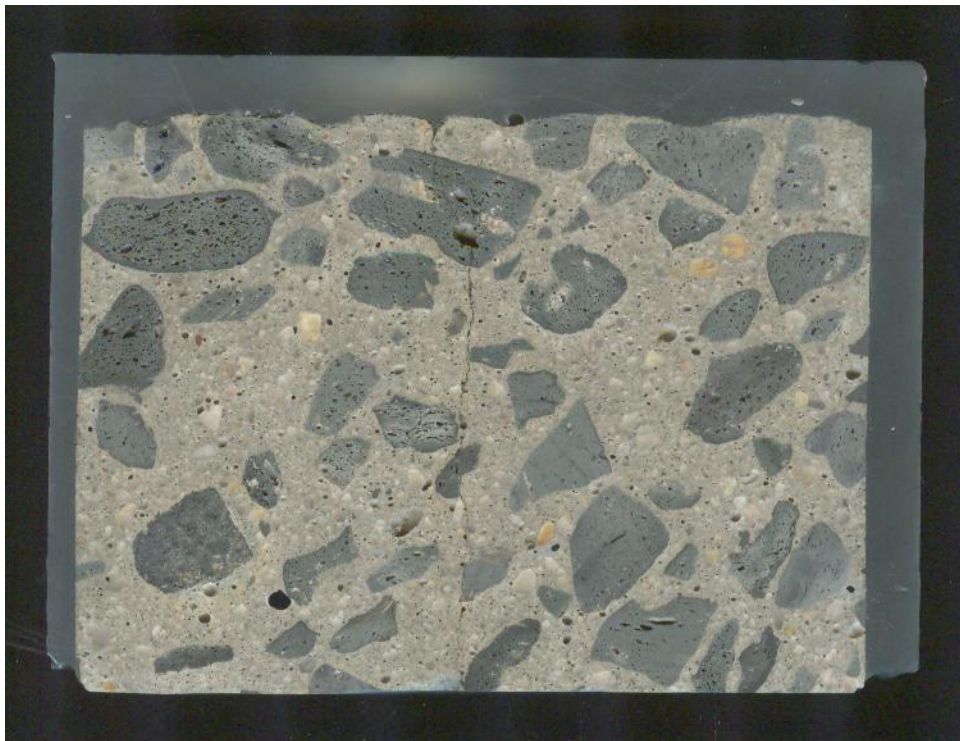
Scanned image of polished surface prepared from bridge deck 9L, core C-8. Bridge deck surface is at top. Note that core has been encapsulated in resin prior to sawcutting due to crack.
